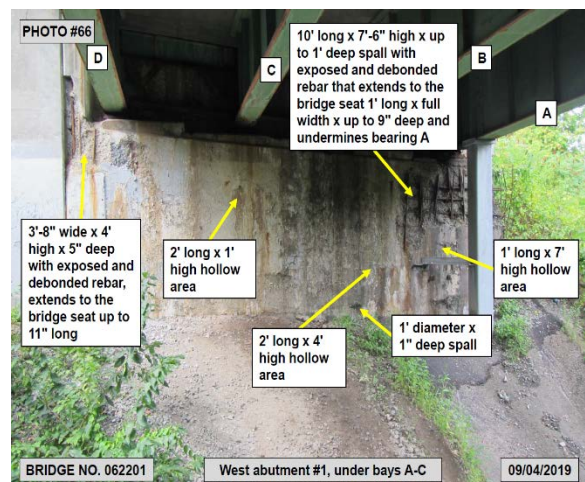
WEST ABUTMENT, BRIDGE 622
